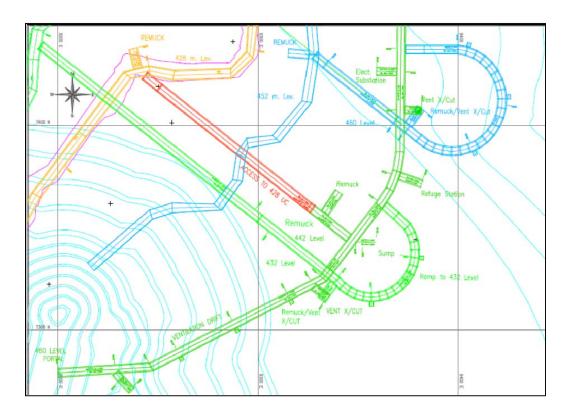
Plan View of Ramp from Surface to 468 Level
